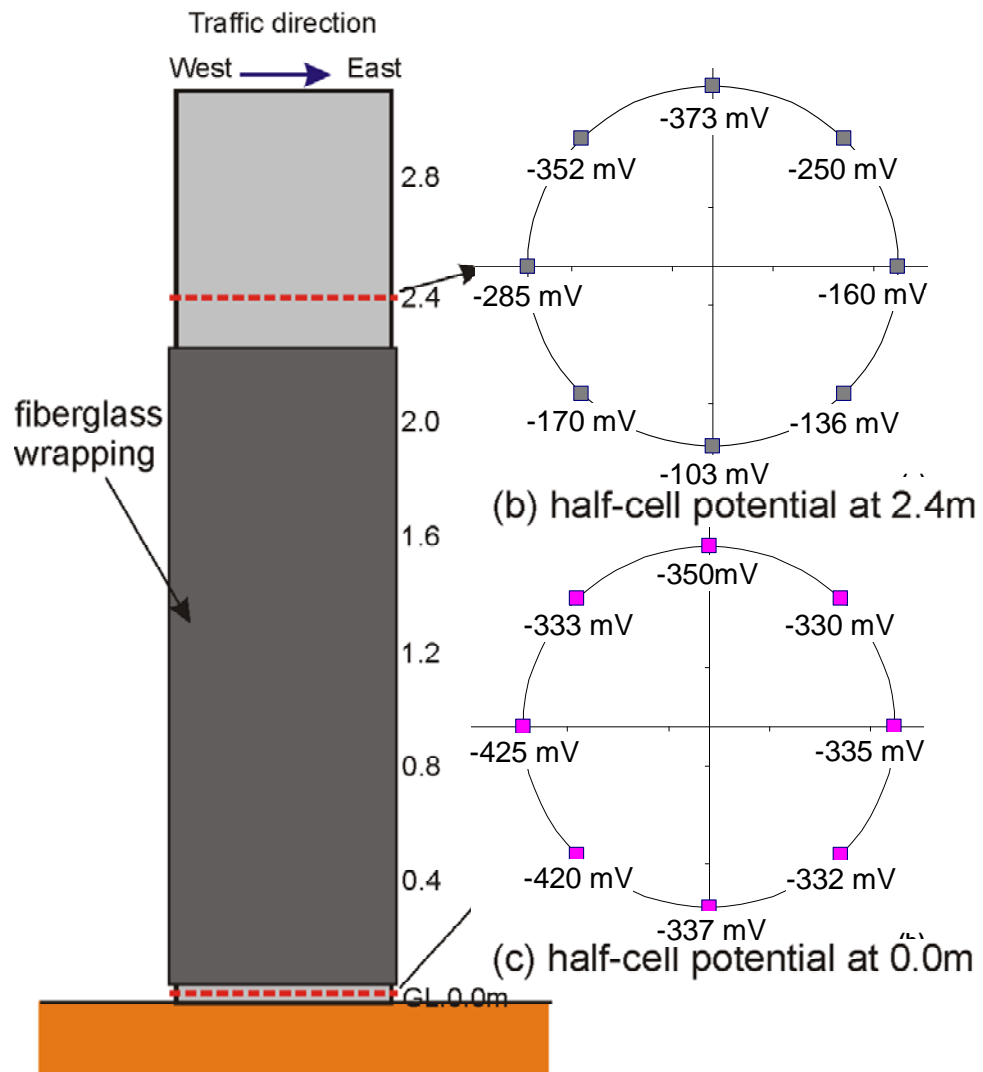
Half cell potential measurement in Bridge B-28-45 column A (summer 2008): (a) above wrap and (b) below wrap.
